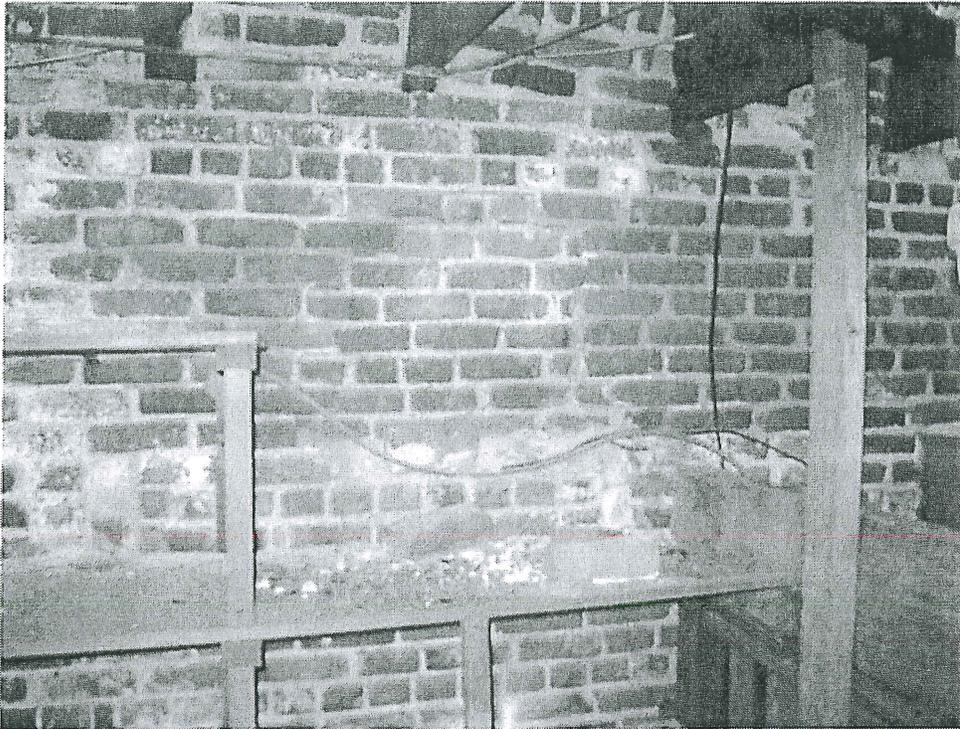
Masonry failure at the east side of the Reid and Hughes near above the 4th floor
